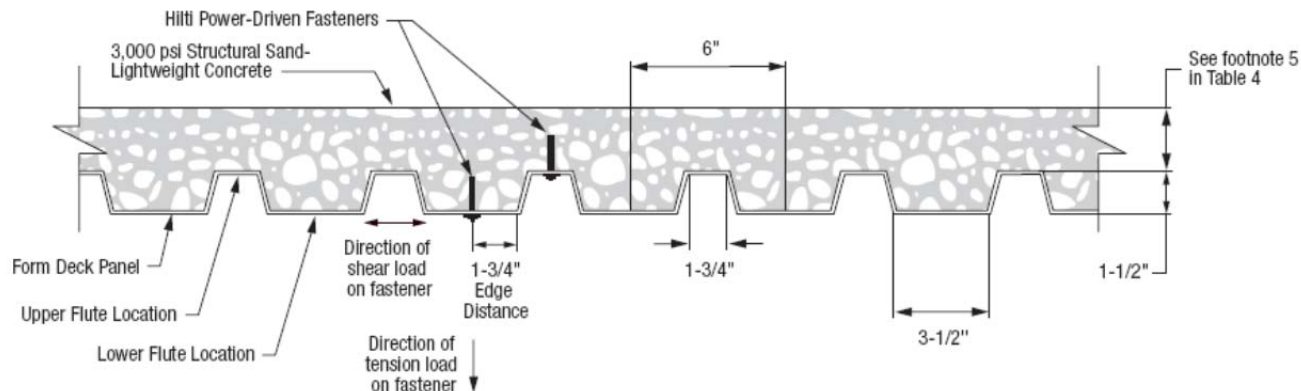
HILTI FASTENER LOCATIONS IN 1 1/2-INCH-DEEP COMPOSITE FLOOR DECK PANEL
